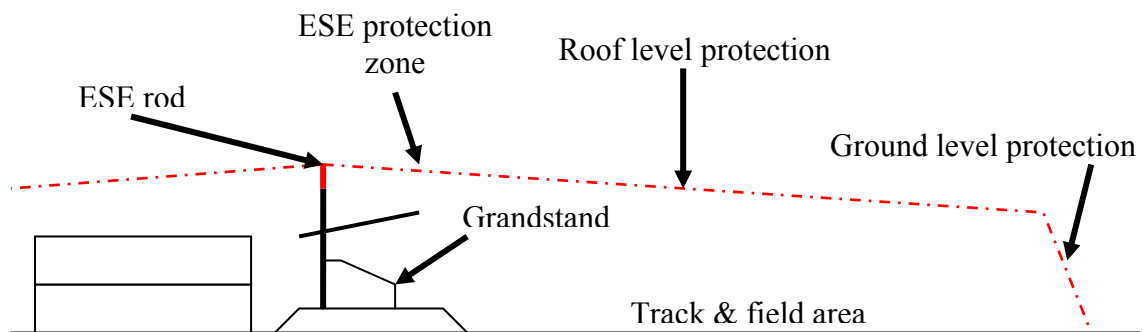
The claimed ESE protection zone at the KIUM mini-stadium.
